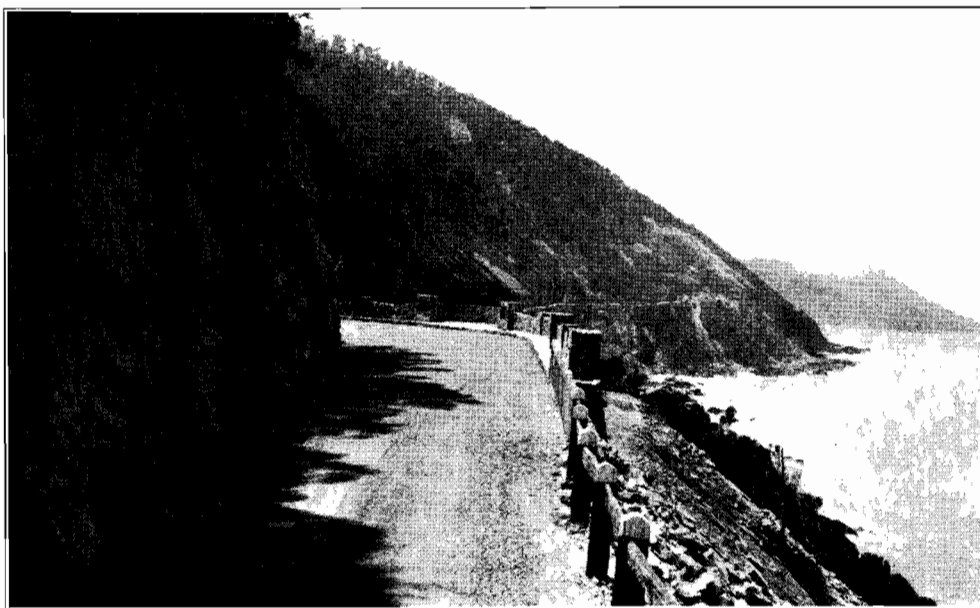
Section of the Great Ocean Road at Mount Defiance.
